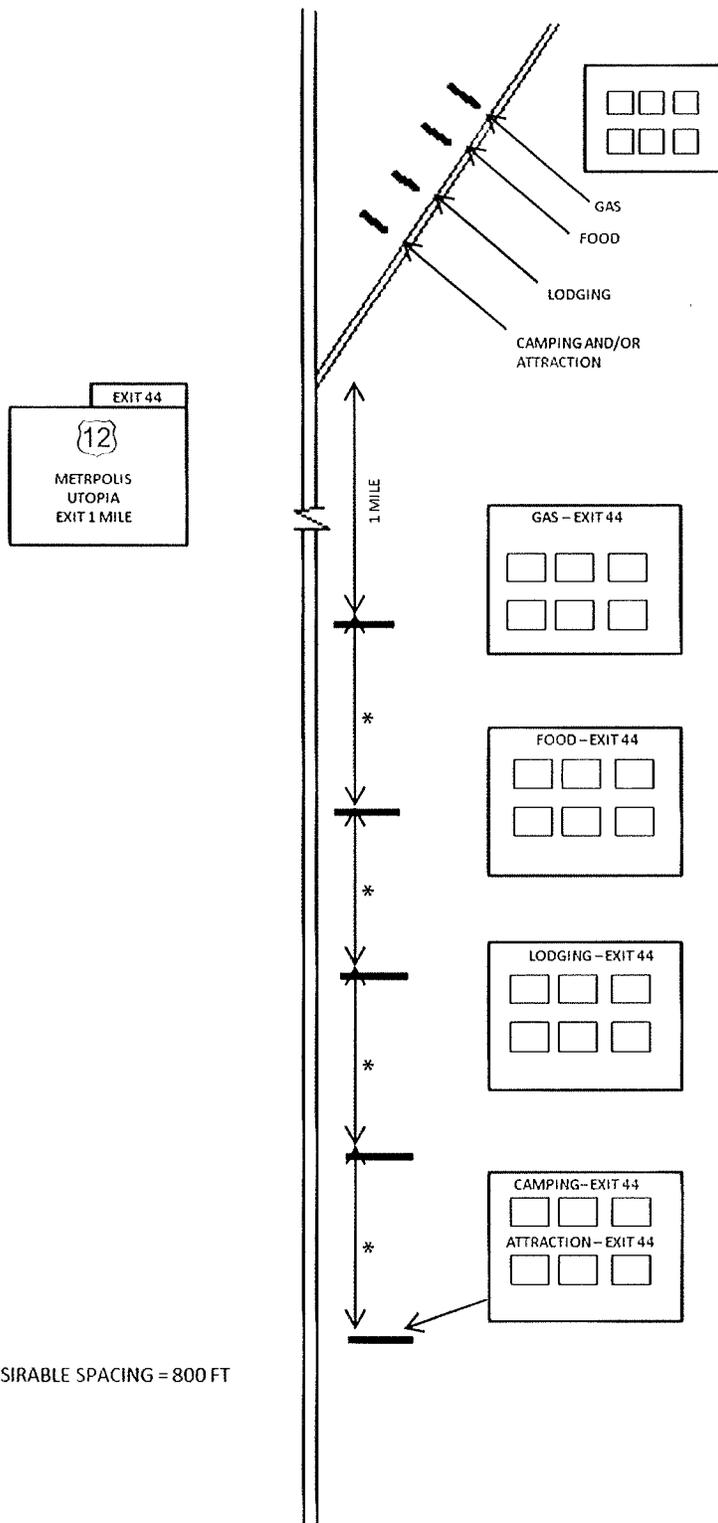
TYPICAL SIGN LOCATION DETAIL
